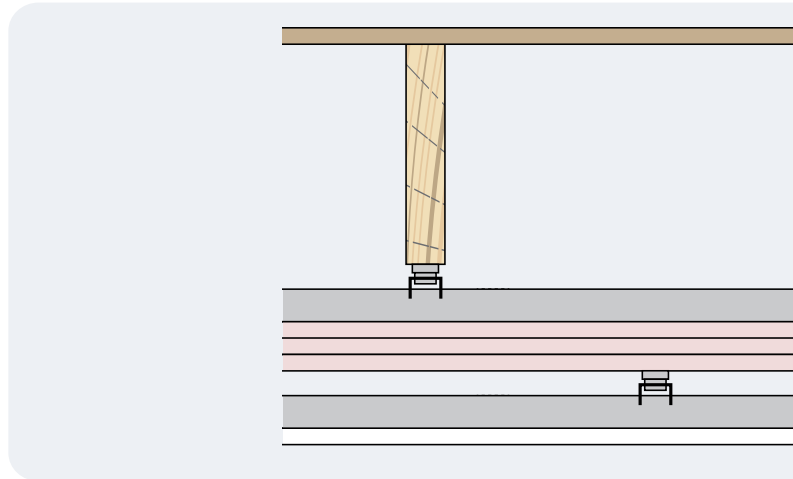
False ceiling detail for minimising service penetrations through ceiling systems.
